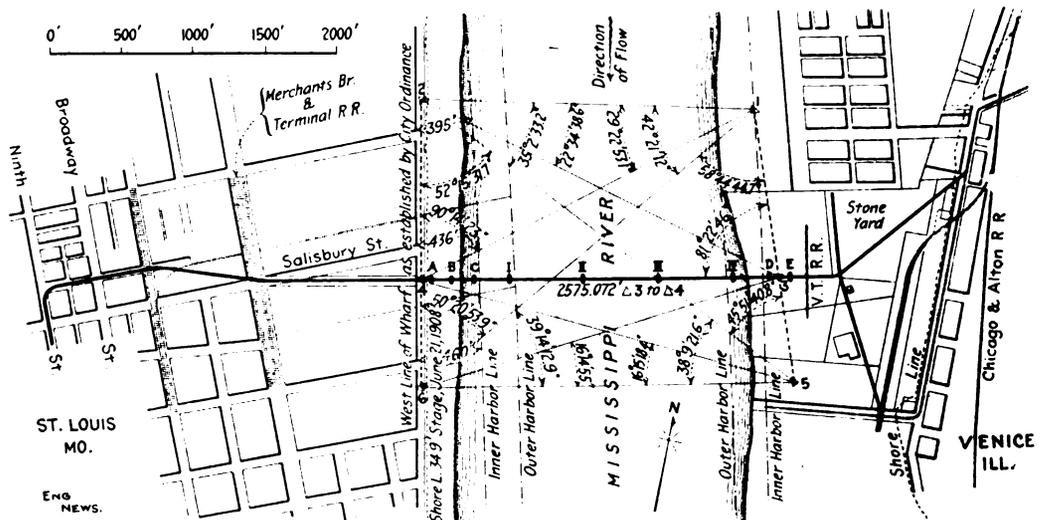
PLAN OF THE TRIANGULATION SYSTEM FOR LOCATING THE PIERS OF THE MCKINLEY BRIDGE.
